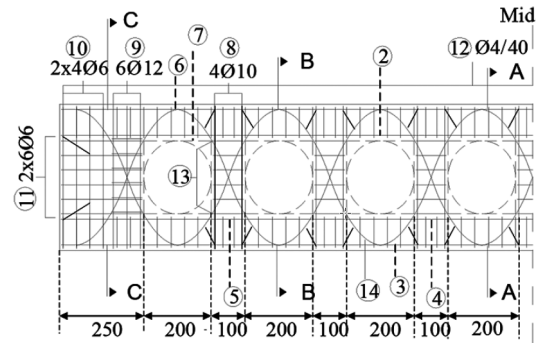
RCxcb. Rebar- and concrete cross section. Dimensions in mm. Modelling tool [Autodesk Inc., 2018].
